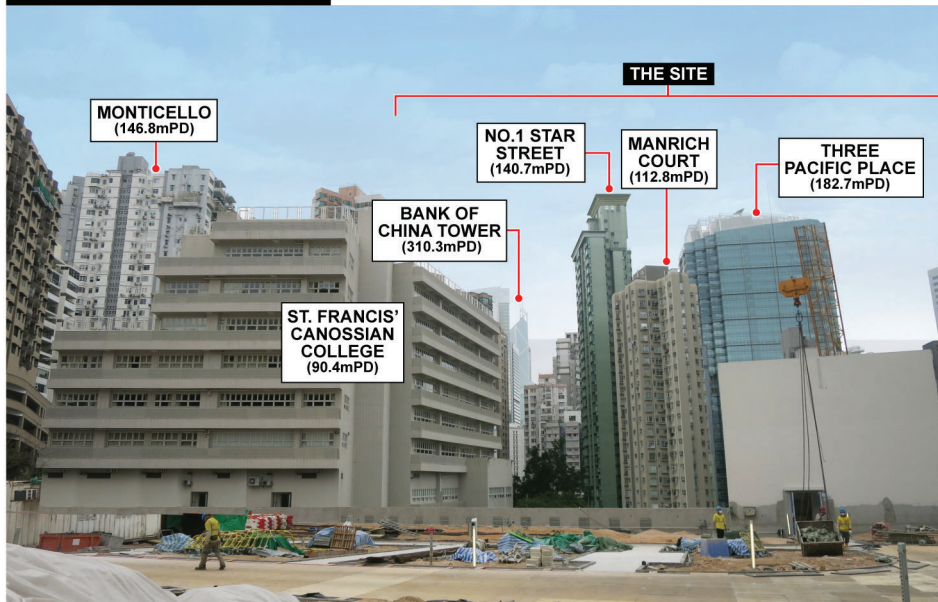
VIEWPOINT 7 : VIEW FROM BOWEN ROAD TO THE SOUTHEAST OF THE SITE
